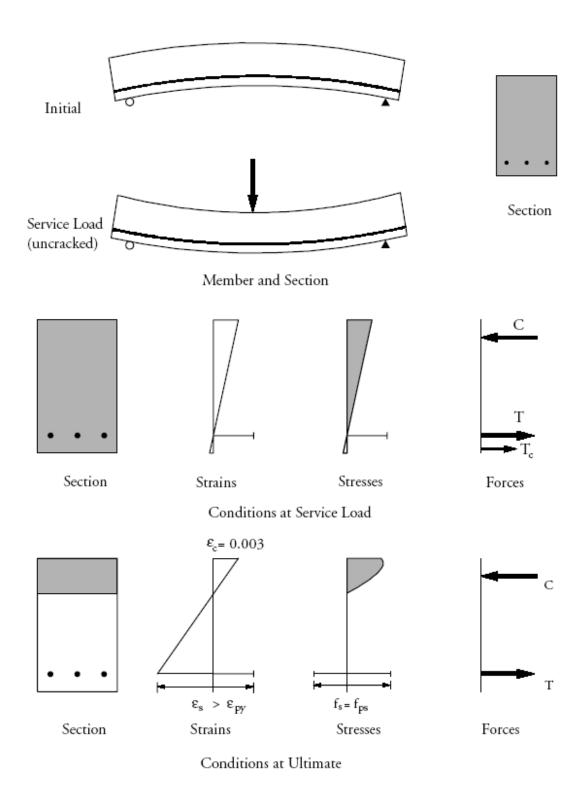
Behaviors of prestressed concrete members (PCI 2003)
